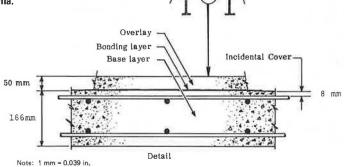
Typical transverse section of two-course bonded concrete bridge decks as constructed in Virginia.
